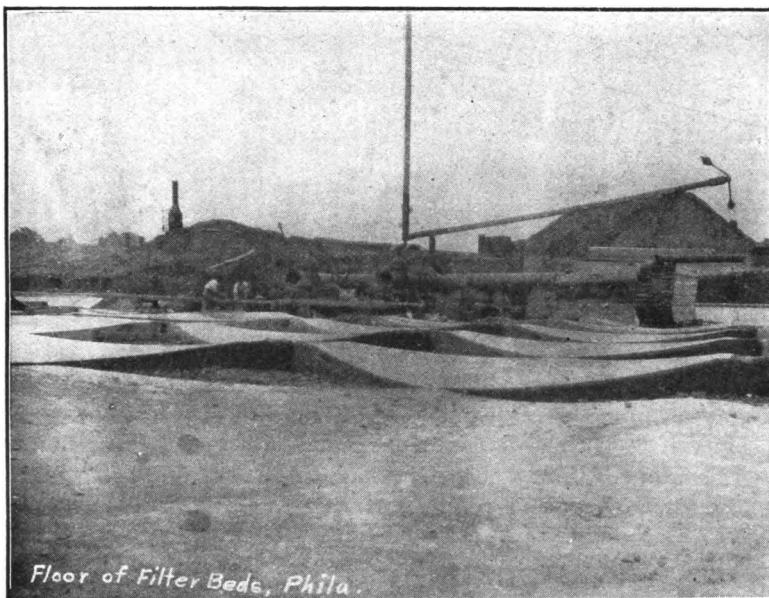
Floor of Filtration Chambers in Process of Construction, Philadelphia, Pa.
